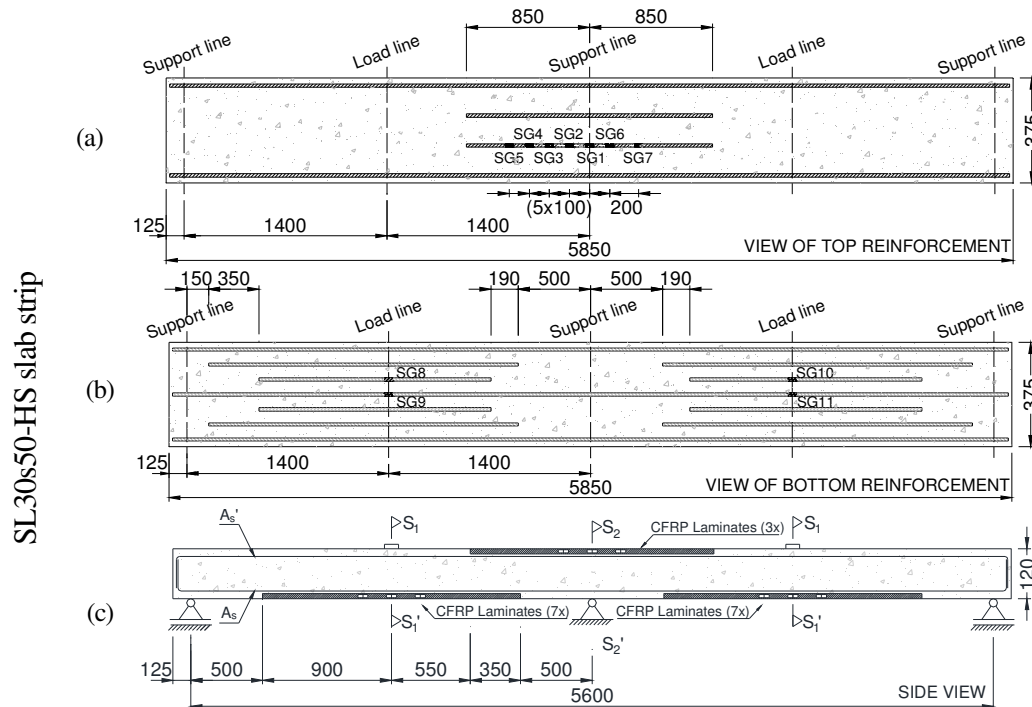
Arrangement of the (a-b) longitudinal steel reinforcement and (c) CFRP laminates of the SL30s50-HS slab strip.
